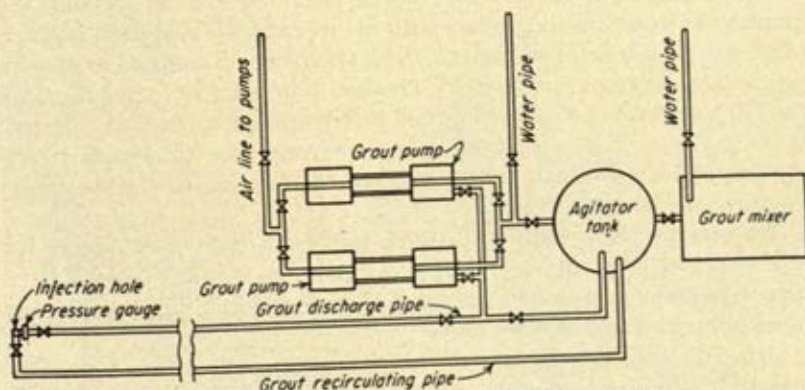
Boulder-type equipment used to inject cement grout.
